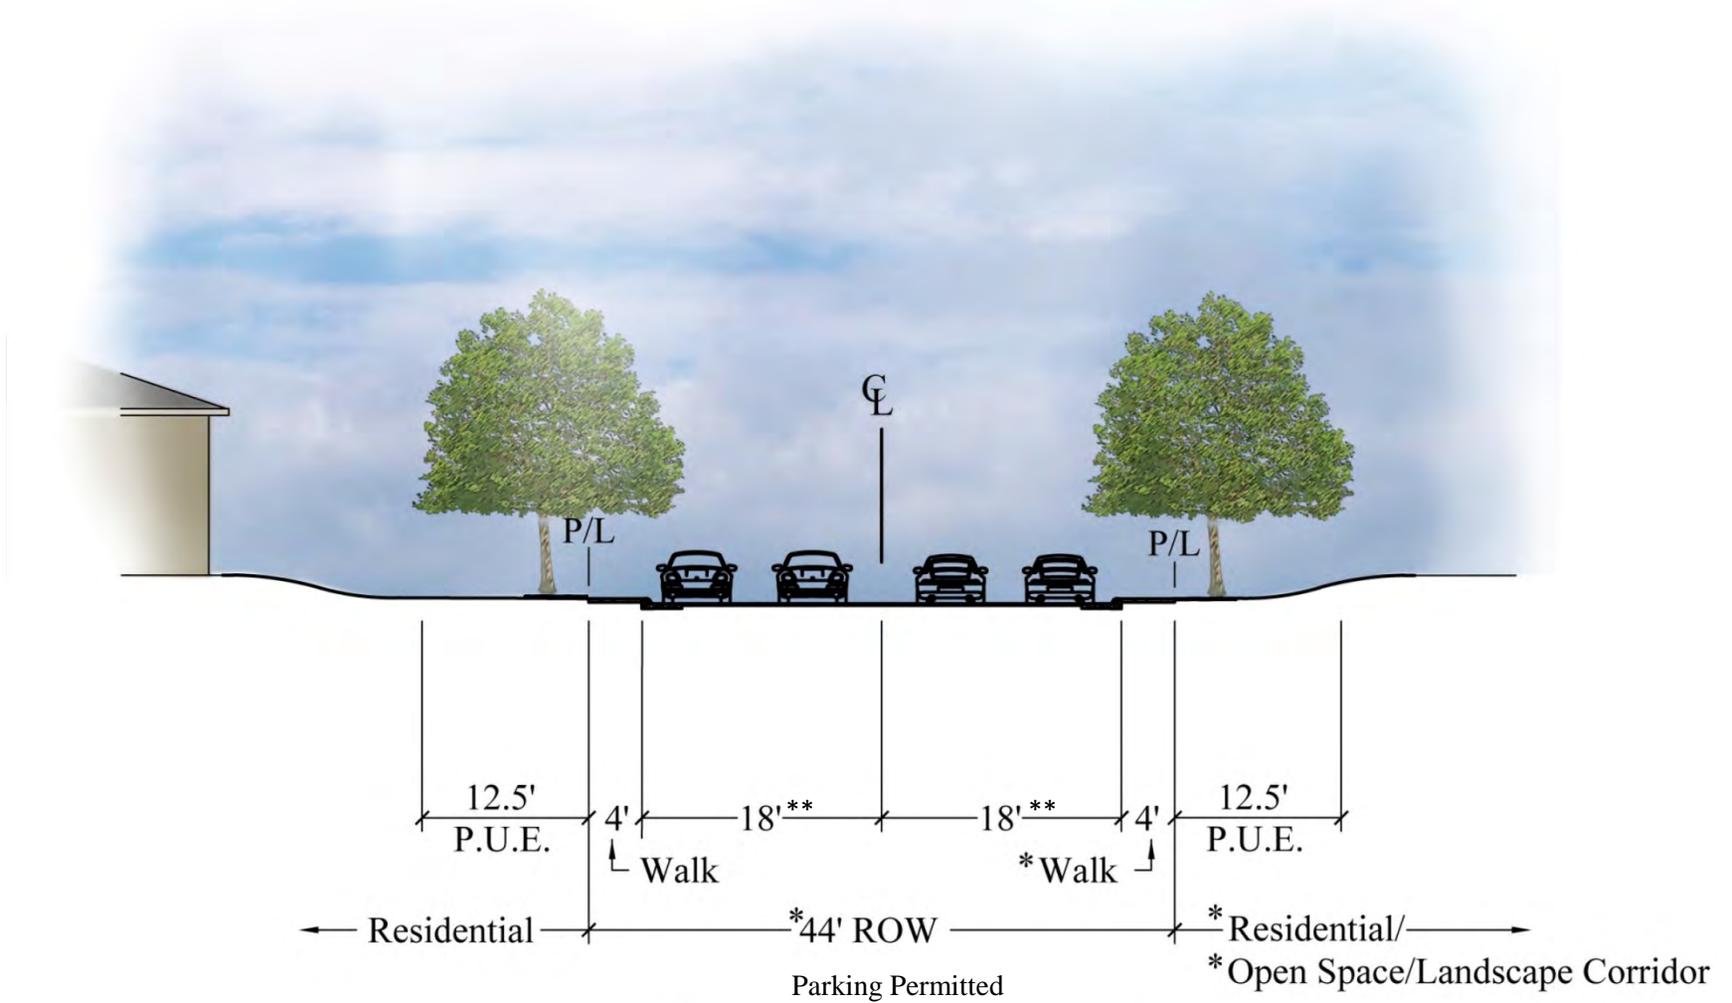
Typical Local Primary Residential Street Plan View
